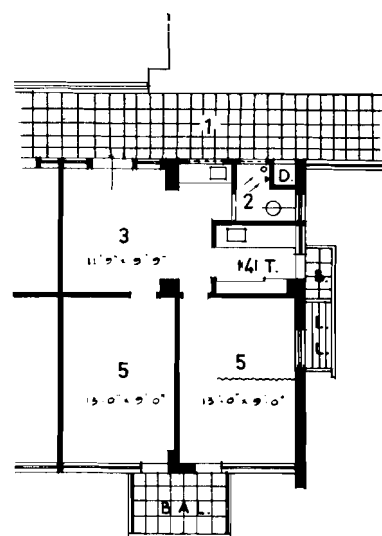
Hong Kong Housing Authority (1955). Eleven-storey flats, North Point. “Four-square” plan, Type J. Floor area 38.6 m². 1 open entrance balcony, 2 bath, 3 living-room, 4 kitchen, 5 bedroom.
